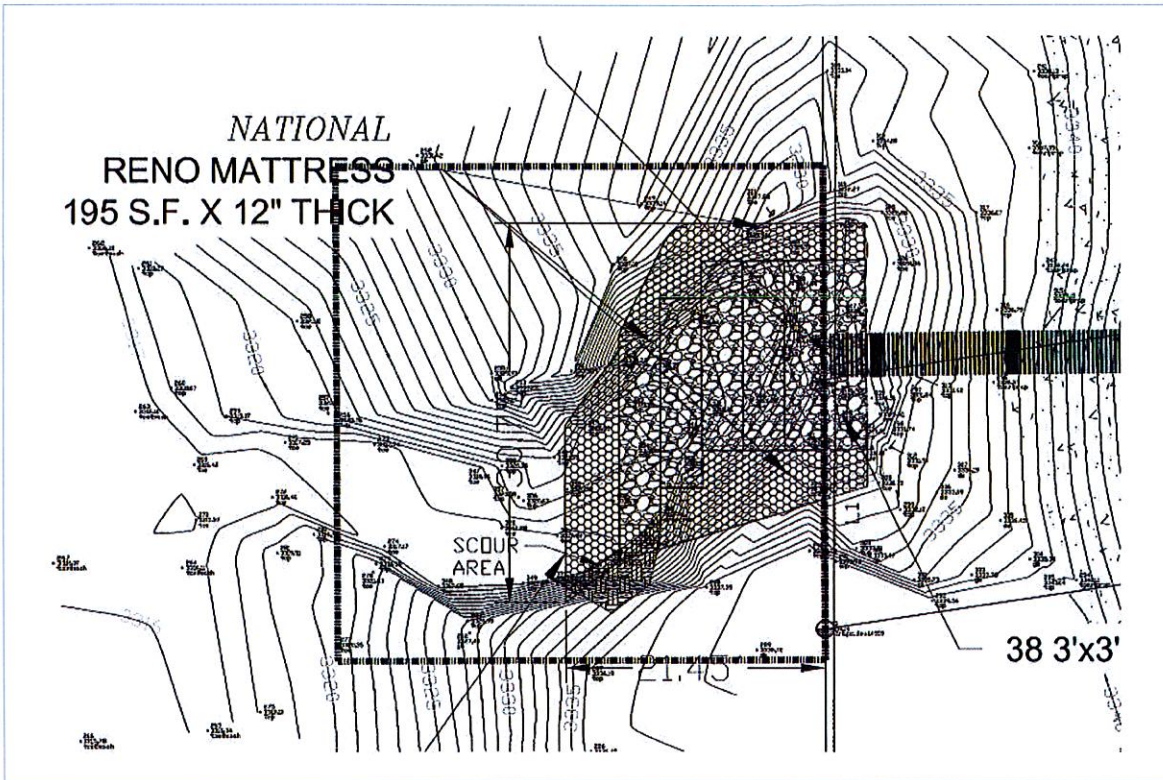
Option 1 drainage mitigation construction design at Amante at Verde Santa Fe. Work taking place on USFS land is limited to the reno mattress and occurs within an existing drainage.
